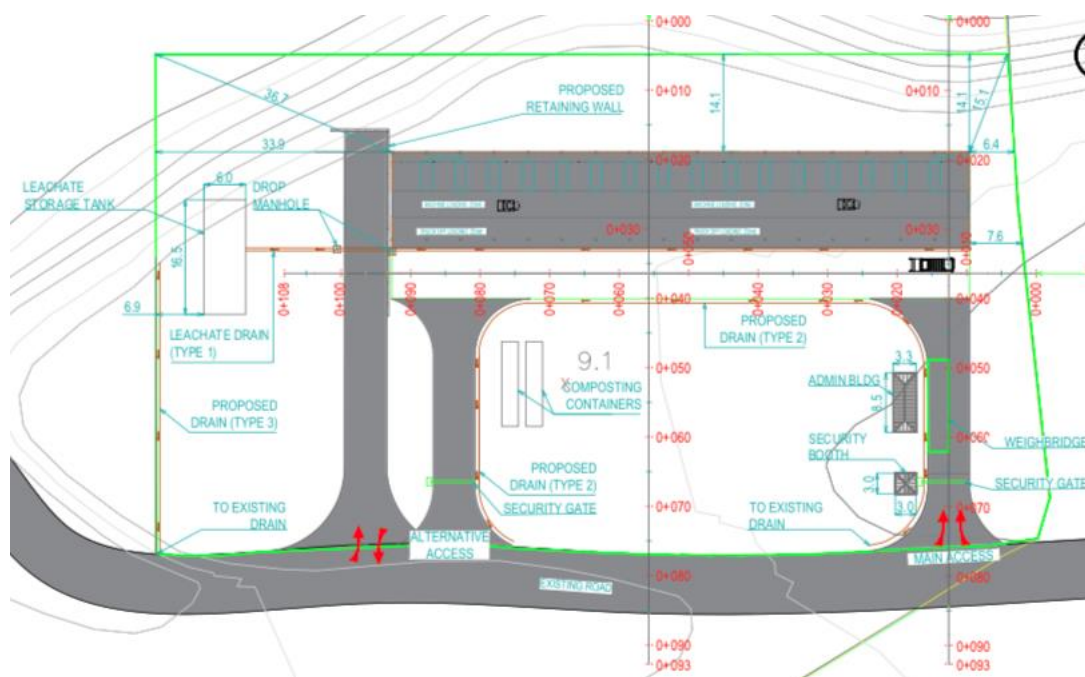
Proposed Kurina Waste Management Facility layout with two composting containers in centre
